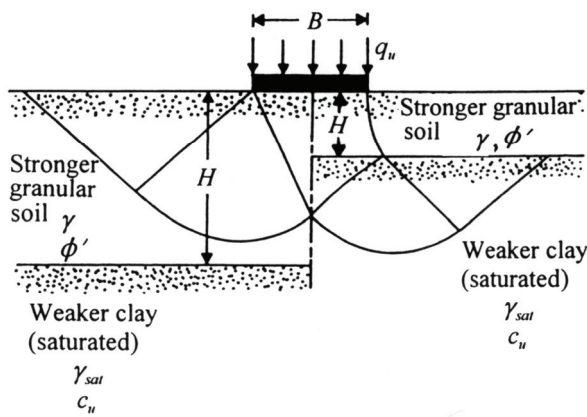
Failure surface under a strip foundation supported by stronger granular soil underlain by weak clay
